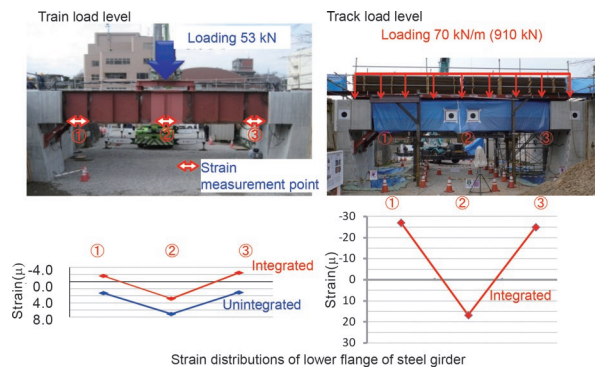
Strain distributions of lower flange of steel girder (static vertical loading test)
